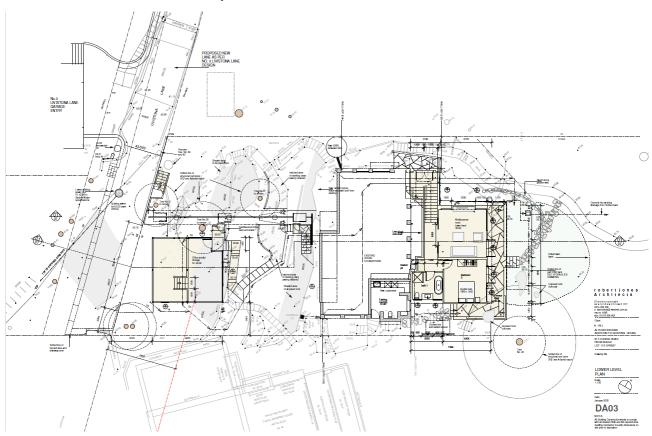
Lower Level Plan Source: Robert Jones Architects, January 2021
